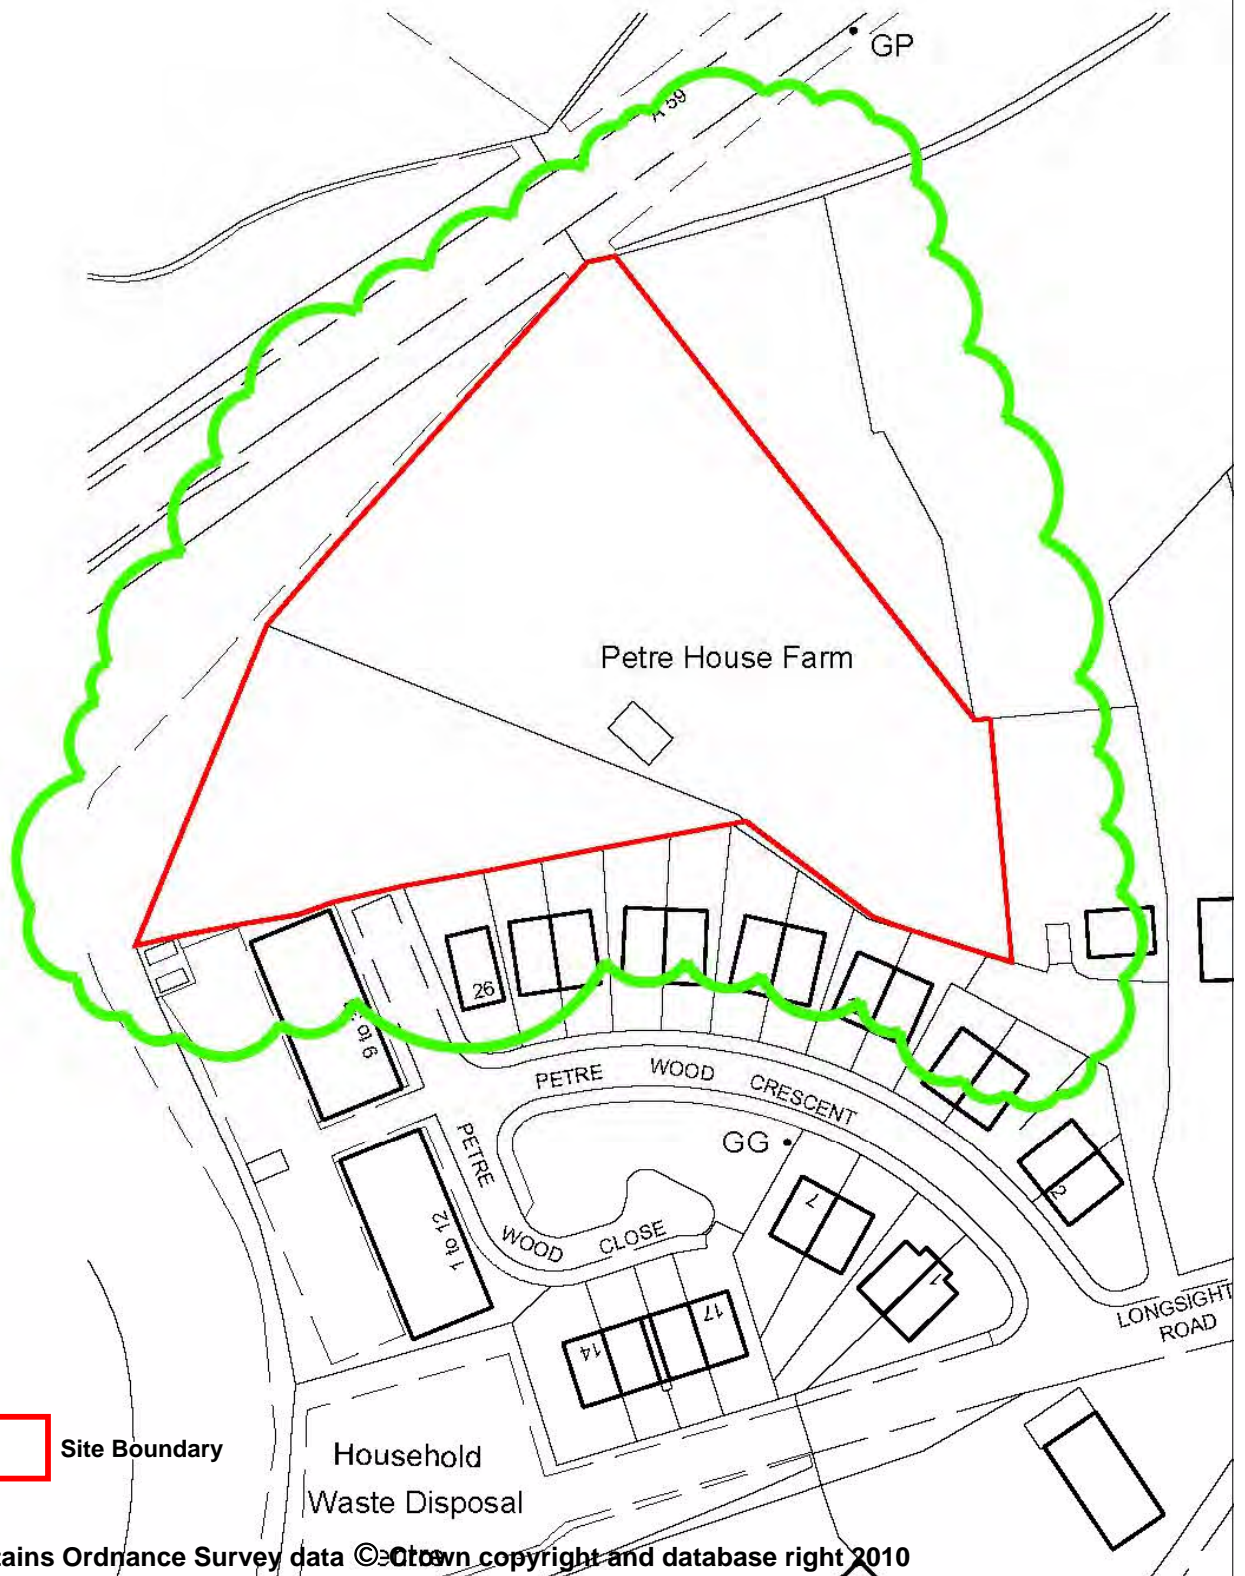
Site Boundary Plan, Land at Petre Wood, Langho, Blackburn
